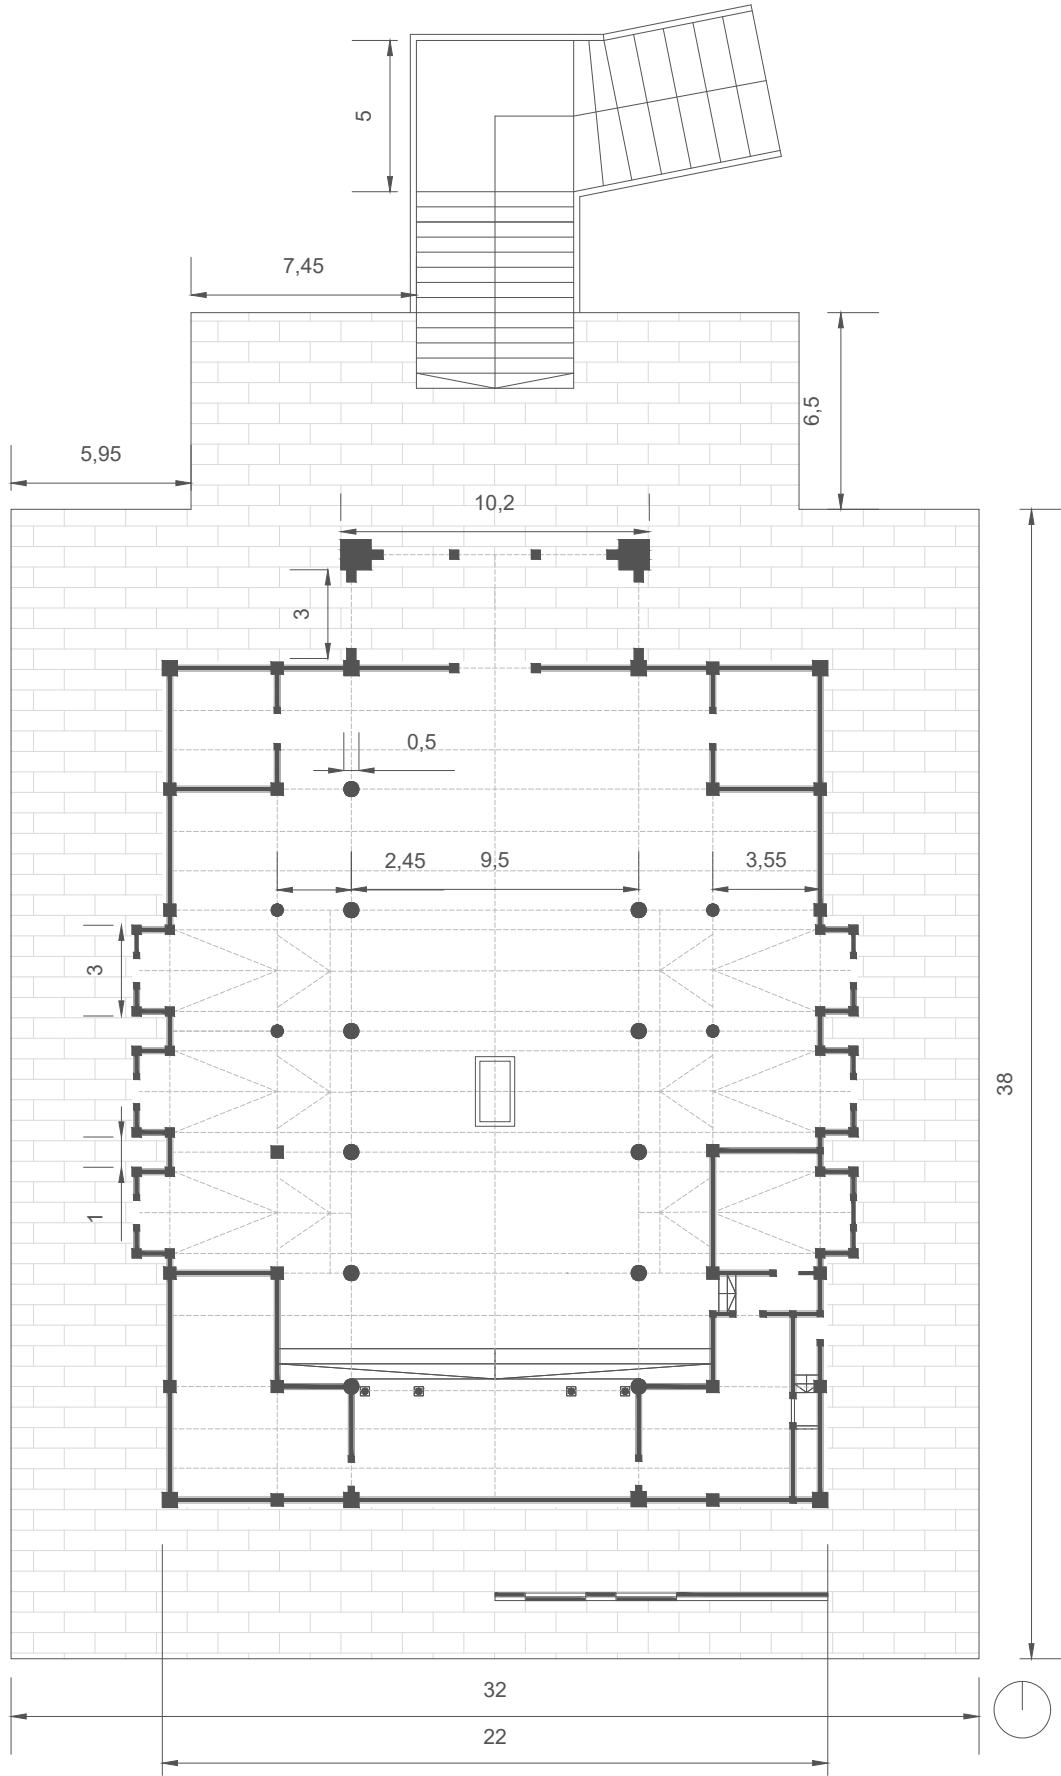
Floor plan of Meduseld 1/250, Own Elavoration
